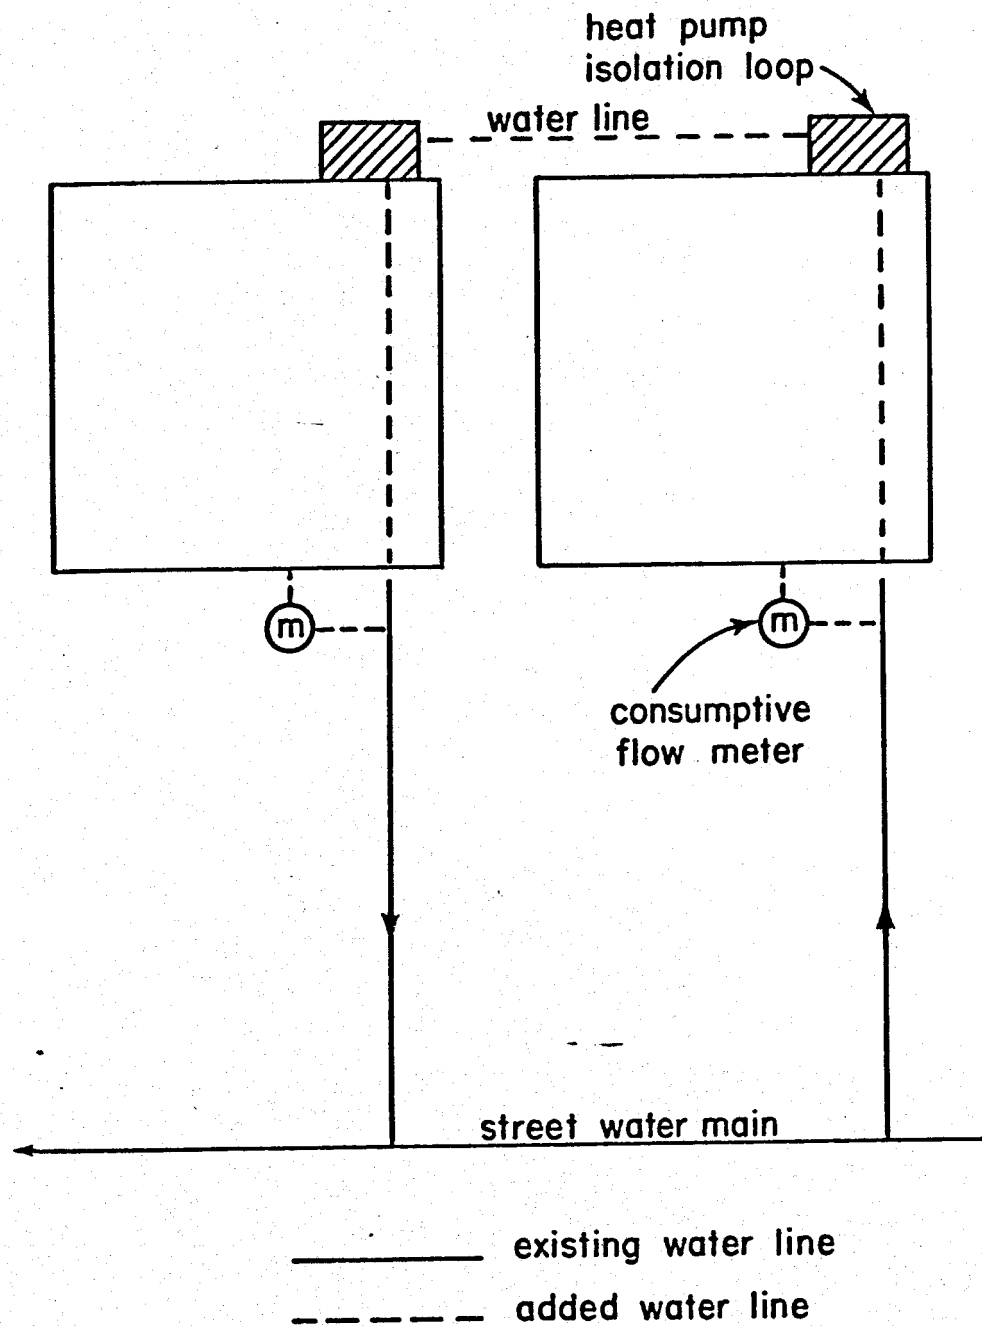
SCHEMATIC OF PROPOSED TWO-HOUSE LOOP WATER PIPING
